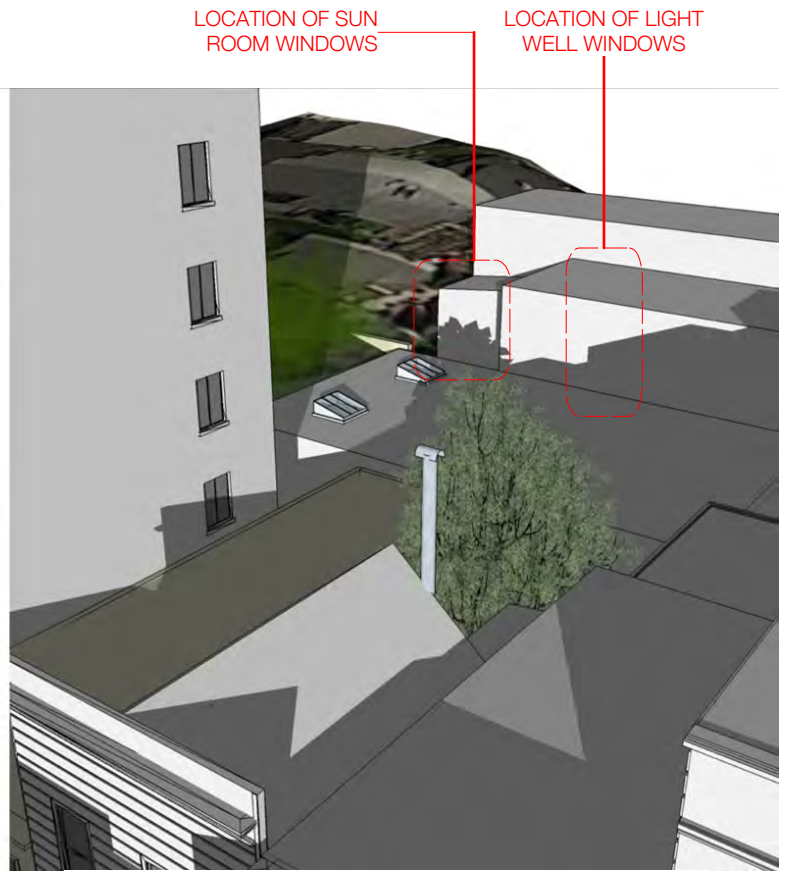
EXISTING SHADOWS - DEC 1ST, 3:30PM
